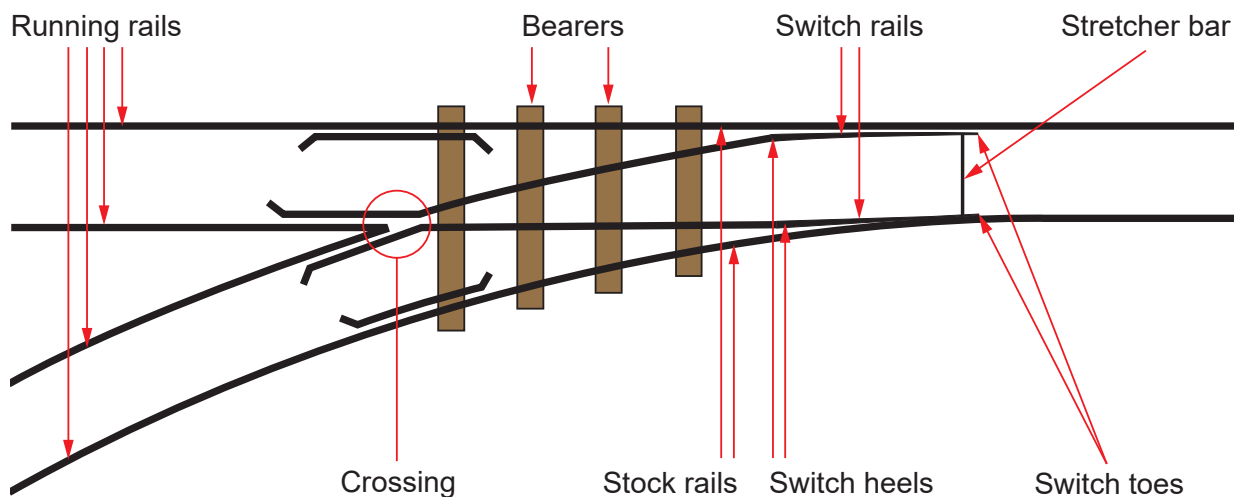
Sketch showing the component parts of a set of points (switch and crossing)
